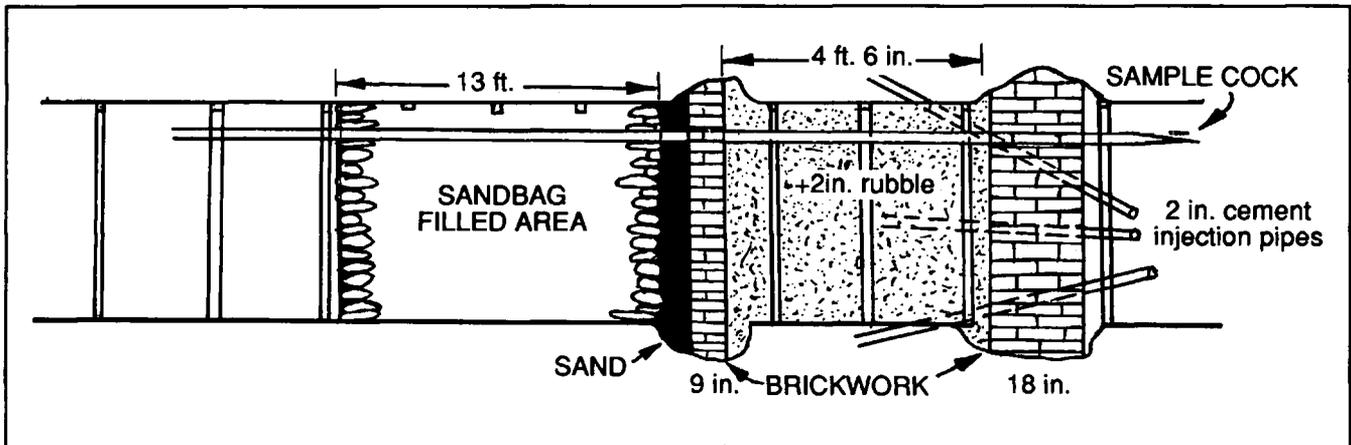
Explosion-proof stopping built of sandbags and brickwork with a rubble filling.
